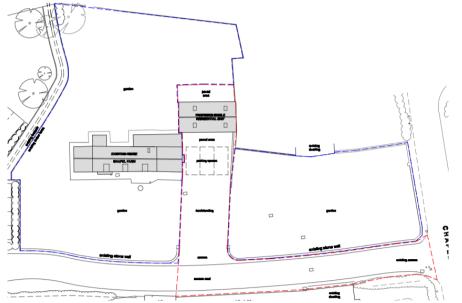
Sub-divided site (left to right 1. Farmhouse, 2. Replacement barn/dwelling, and 3. "Garden")
